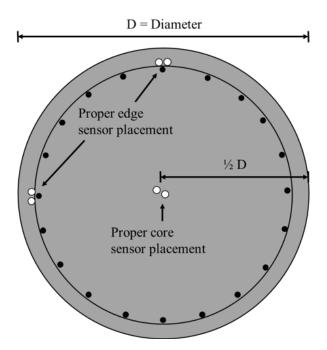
Correct temperature sensor placement on a circular column cross section (example of a horizontally oriented cross section)
